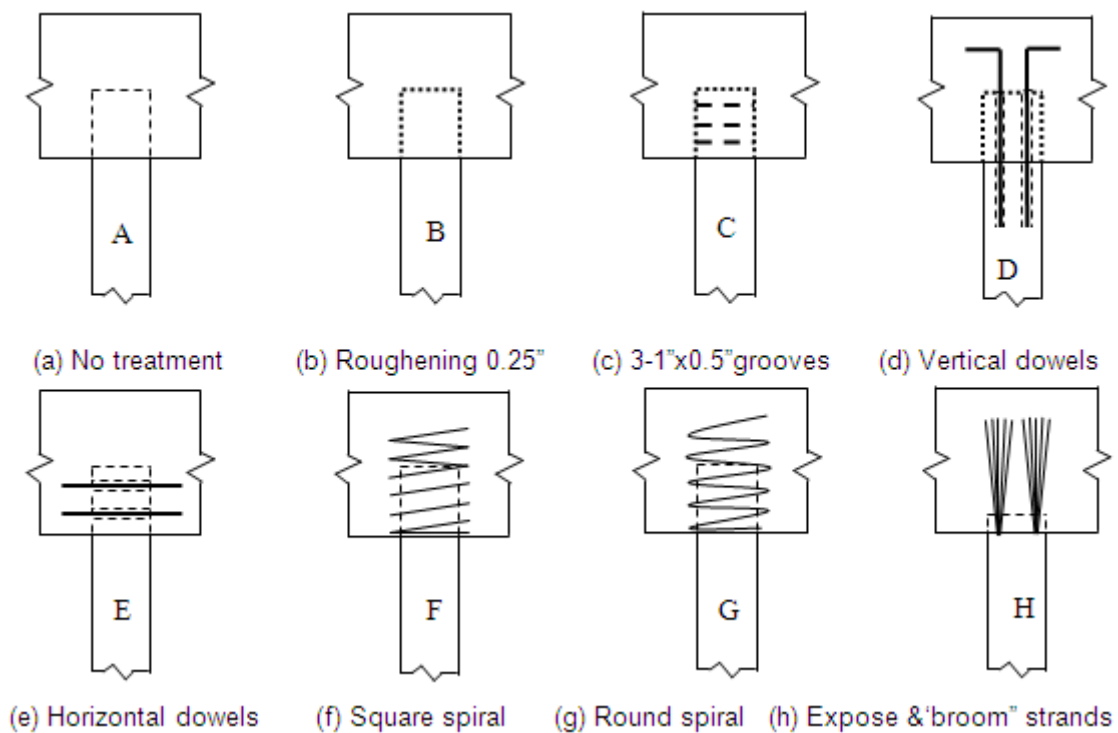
Typical pile-to-pile cap connections proposed by Sheppard (1983)
